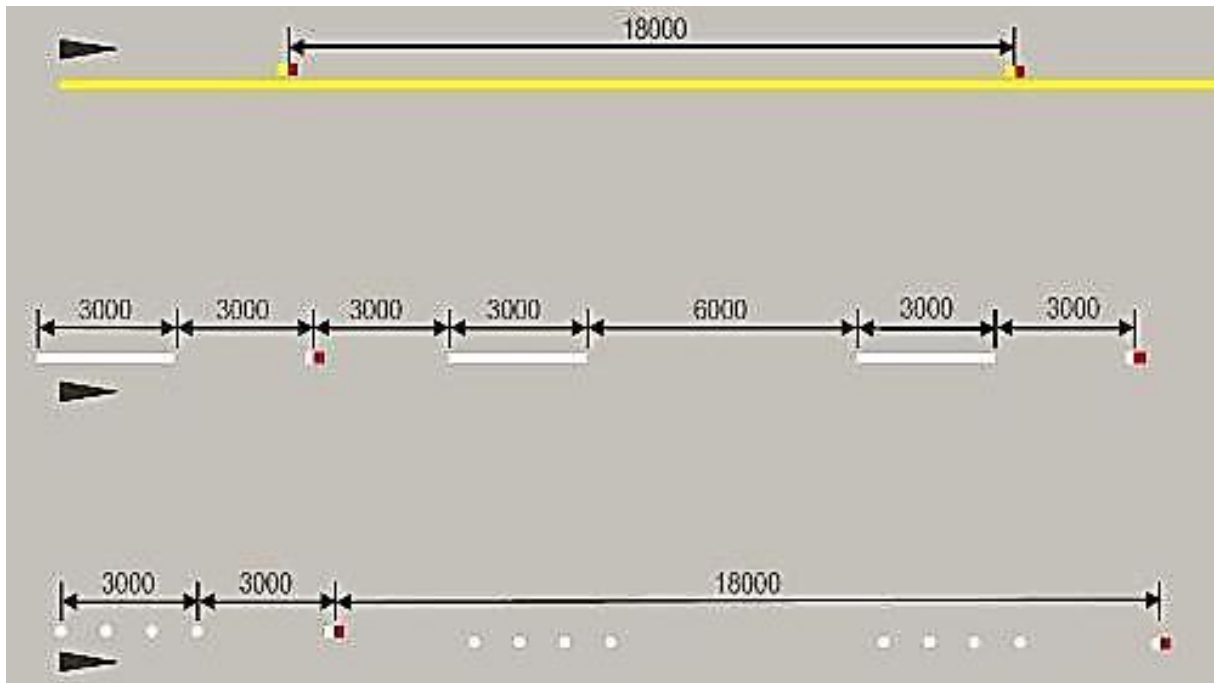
/25: Examples of Raised Pavement Marking Applications
